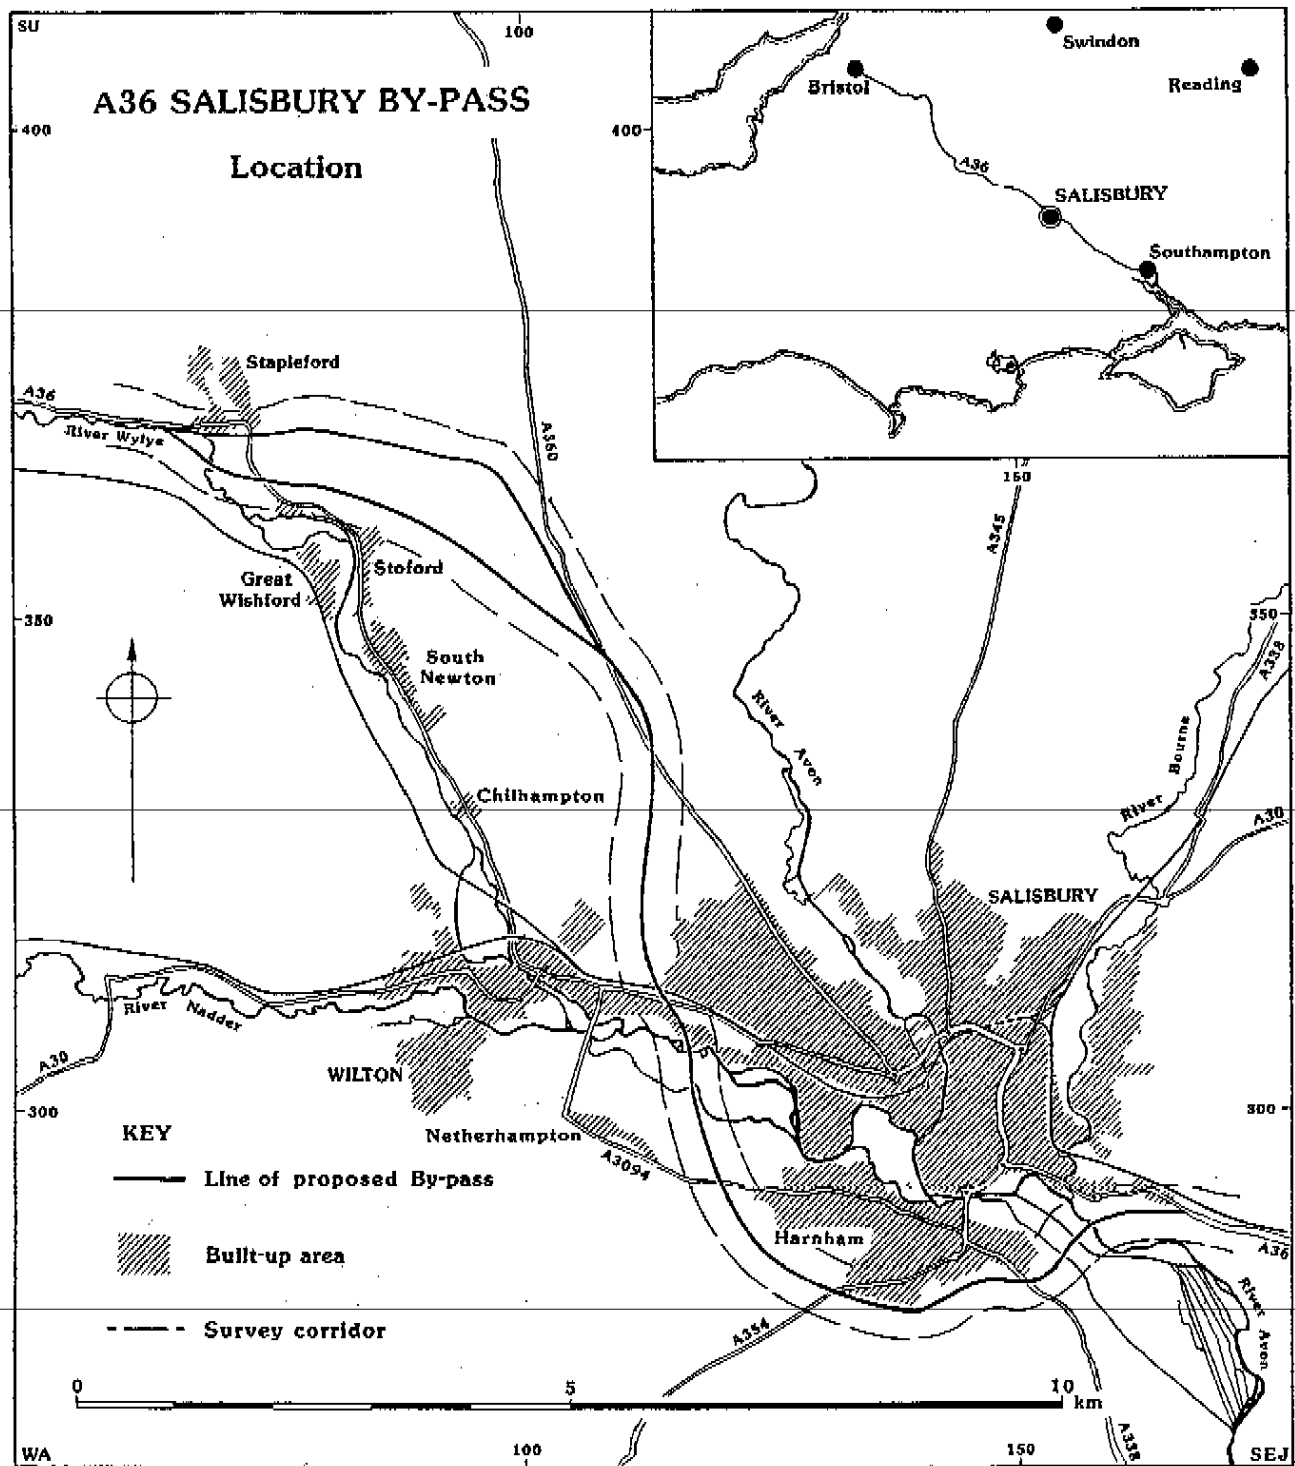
Site plan showing location of proposed Salisbury By-pass
